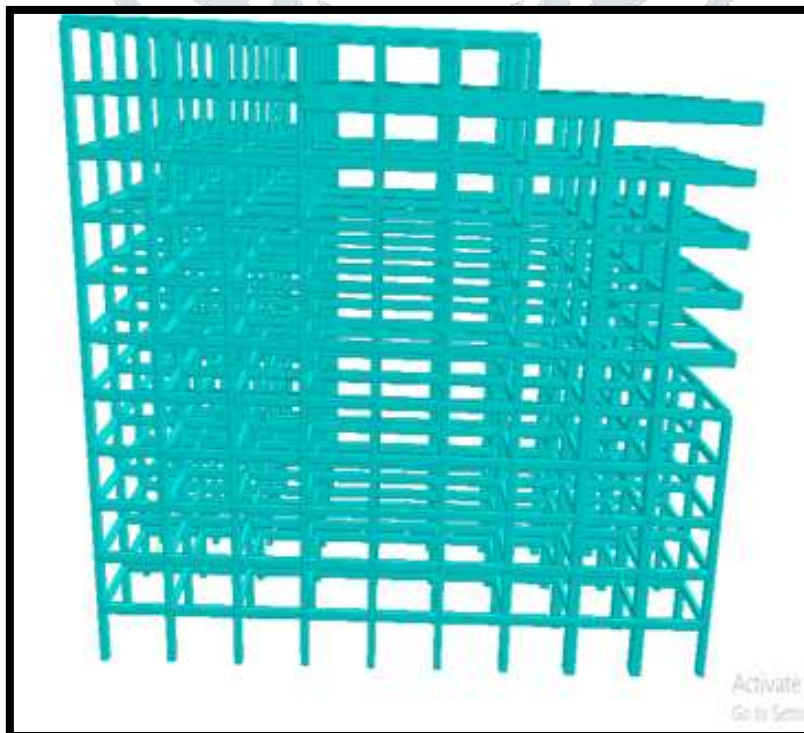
Isometric view of Unsymmetrical structure with cantilever section model.
